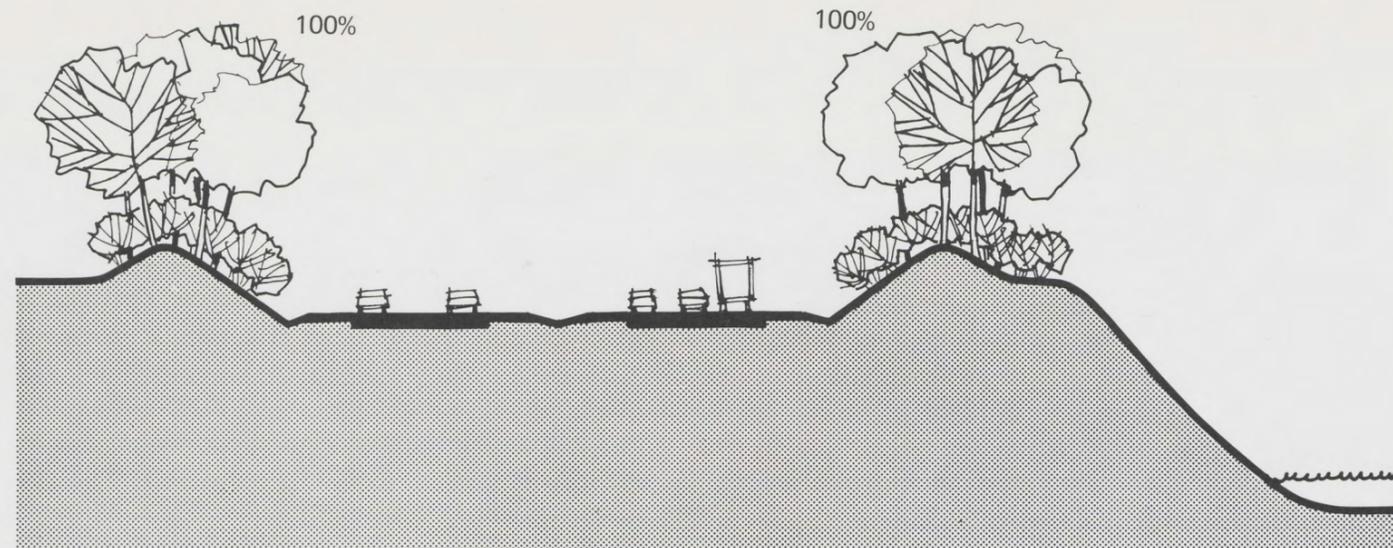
/ TYPICAL LANDSCAPE TREATMENT—FLORIDA AVE. TO JEWELL AVE.
